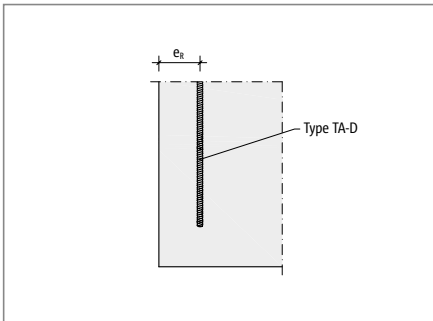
Schöck Isolink® type TA-D: Edge distance  $e_R$  in the wall elevation
